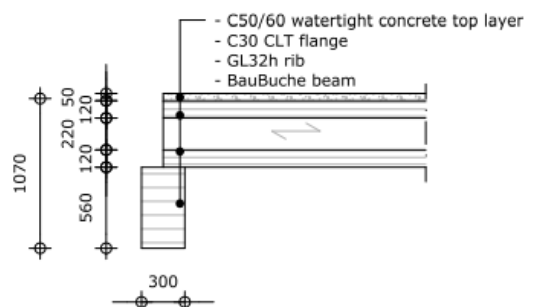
Floor design 3 BauBuche beam detail cross-section C-C minimum height in mm
